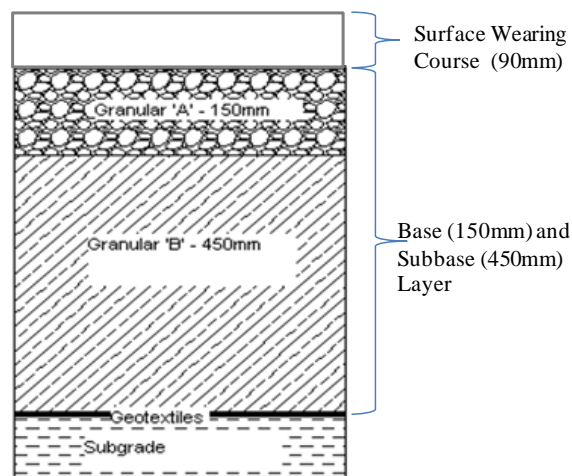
Cross Section of the CPATT Test Track RAS Section
